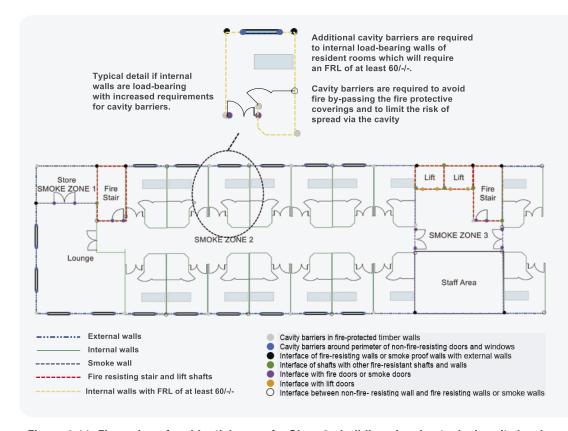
Floor plan of residential area of a Class 9c building showing typical cavity barrier locations.
